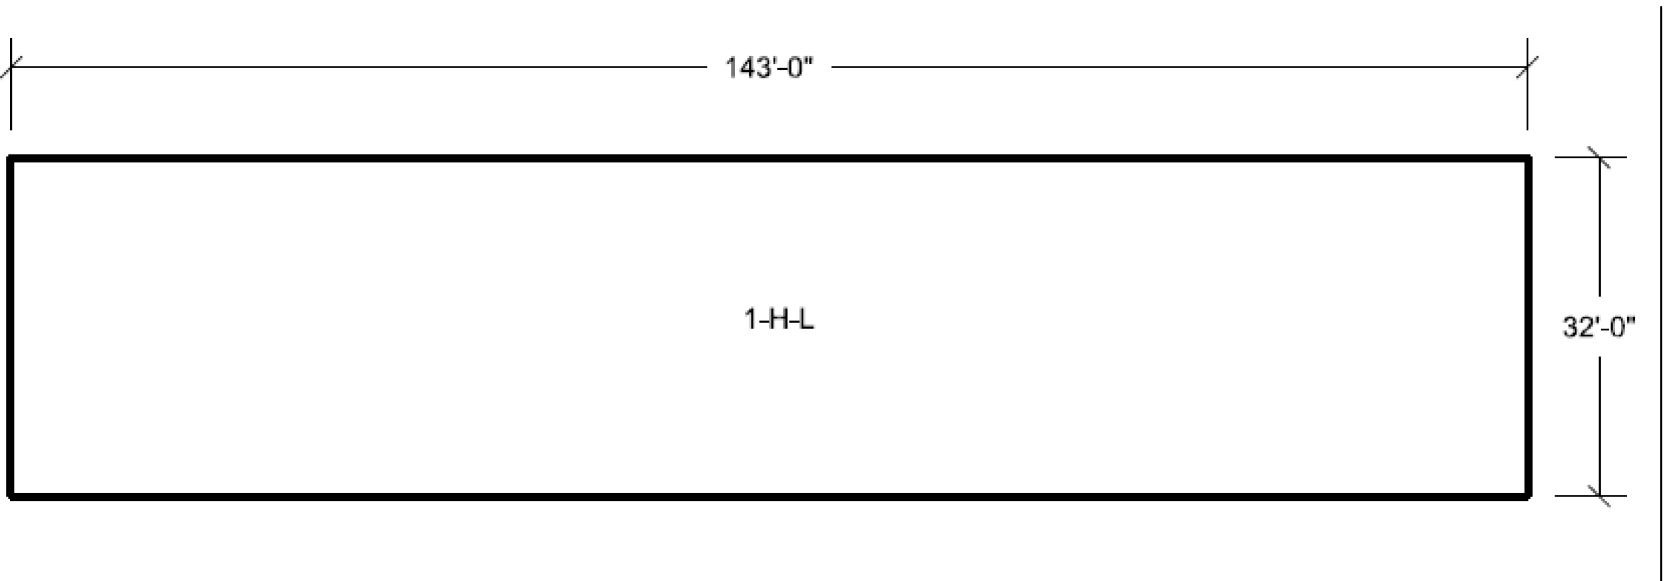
H.6-61 Pump House South Wall Looking South Horizontal Reinforcement Zones Near Side Face
